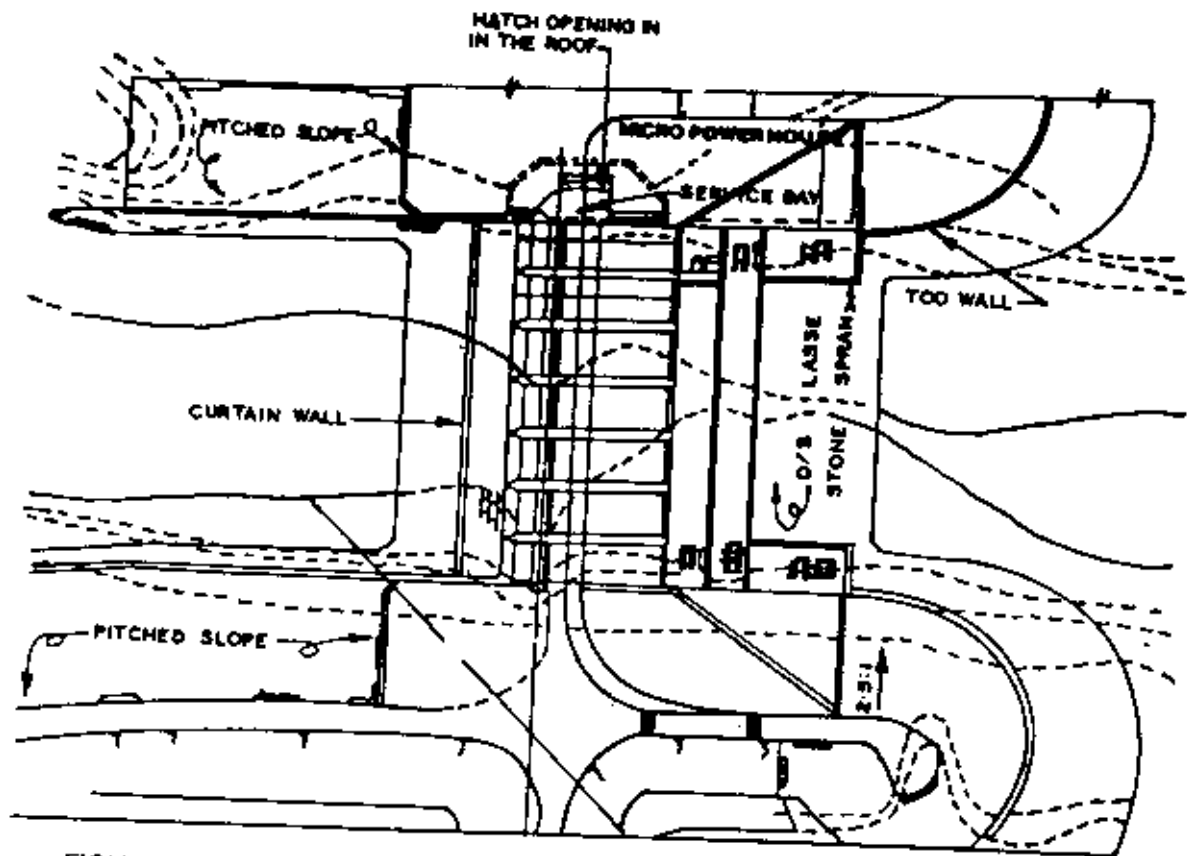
LAYOUT PLAN OF MICROHYDEL PROJECT ON THE SIDE OF ABUTMENT OF THE BARRAGE UNDER CONSTRUCTION
